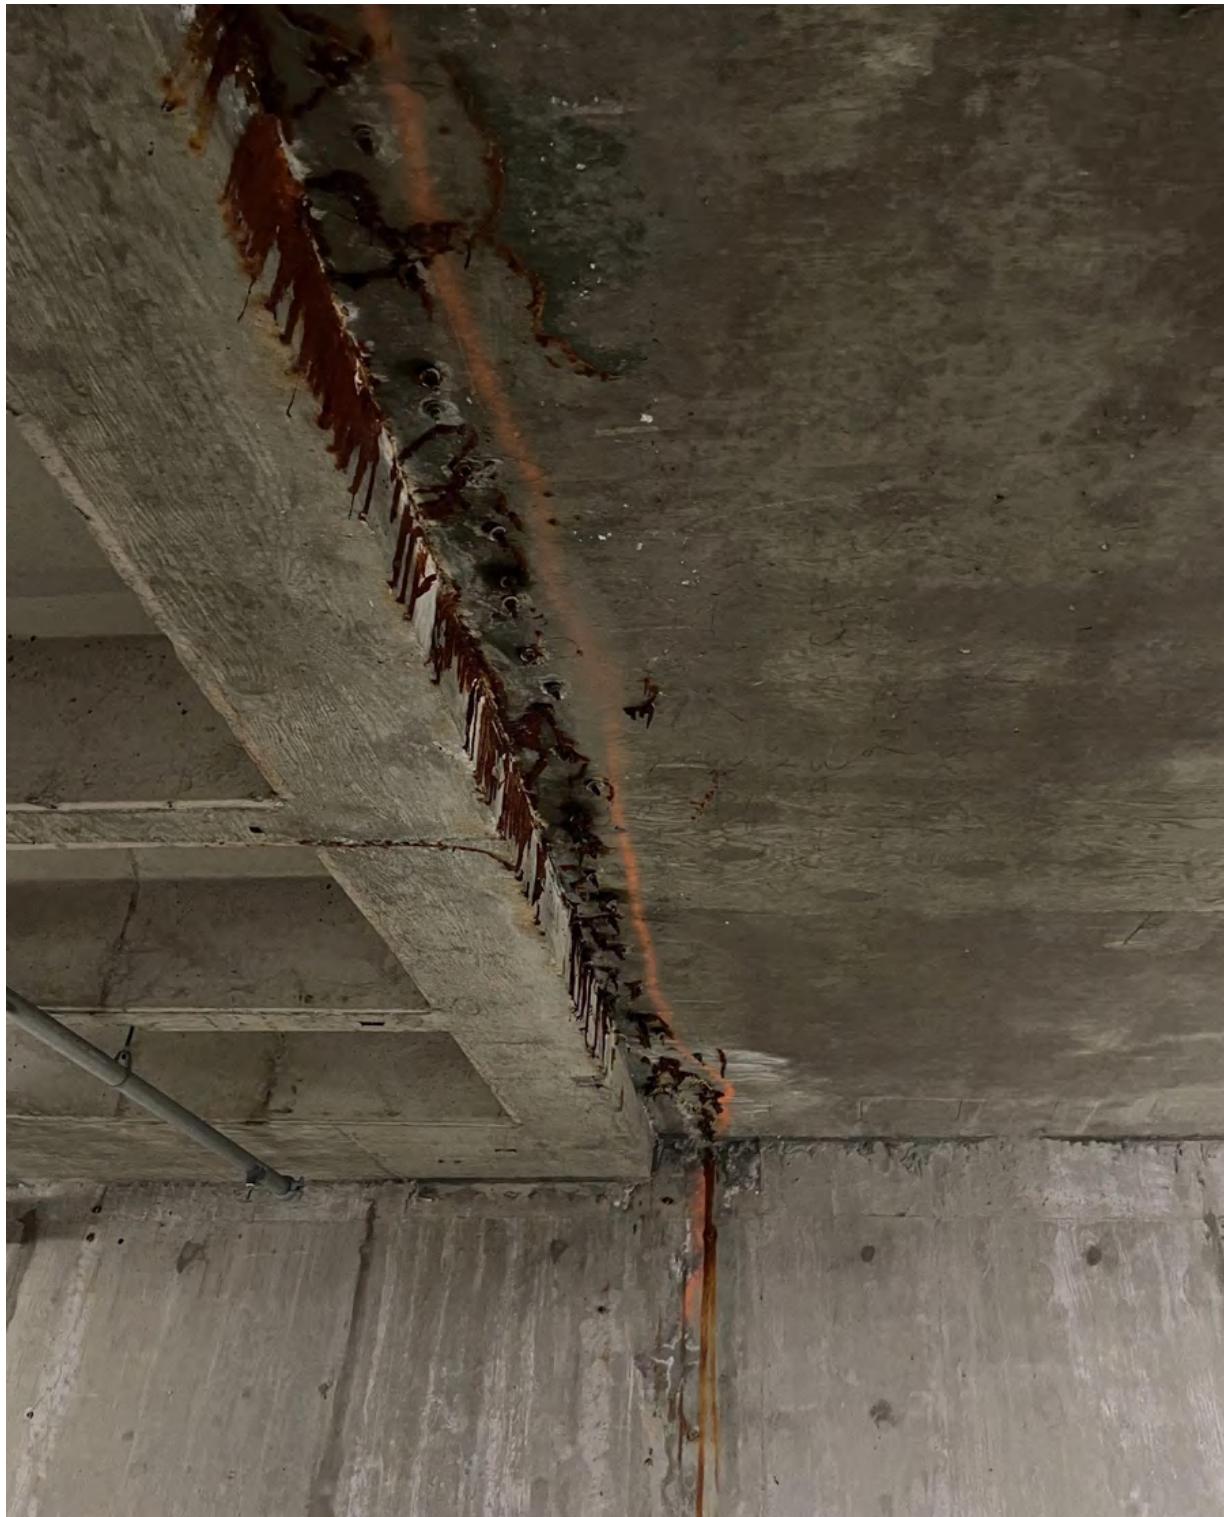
grout injection ports from remedial repairs in the past at ceiling of Upper Garage
